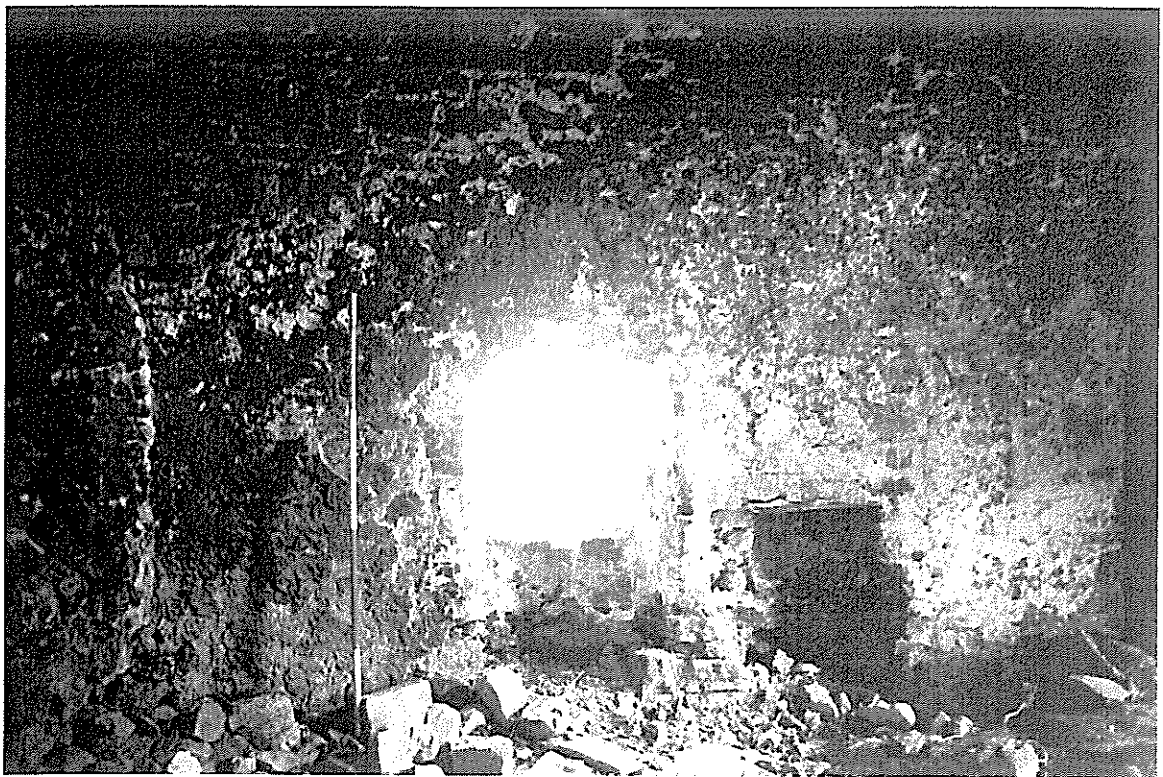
Lydstep Palace, Room 3 interior: East wall - south end
